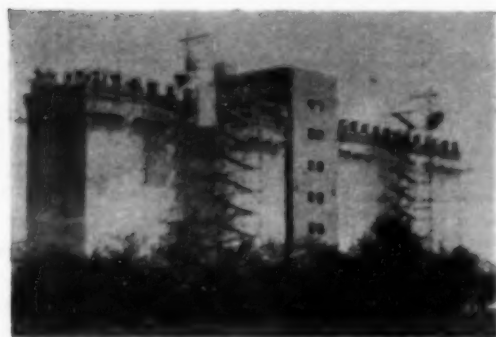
Moving-forms Used in Construction of Rectangular Bins, showing Access to Deck.
